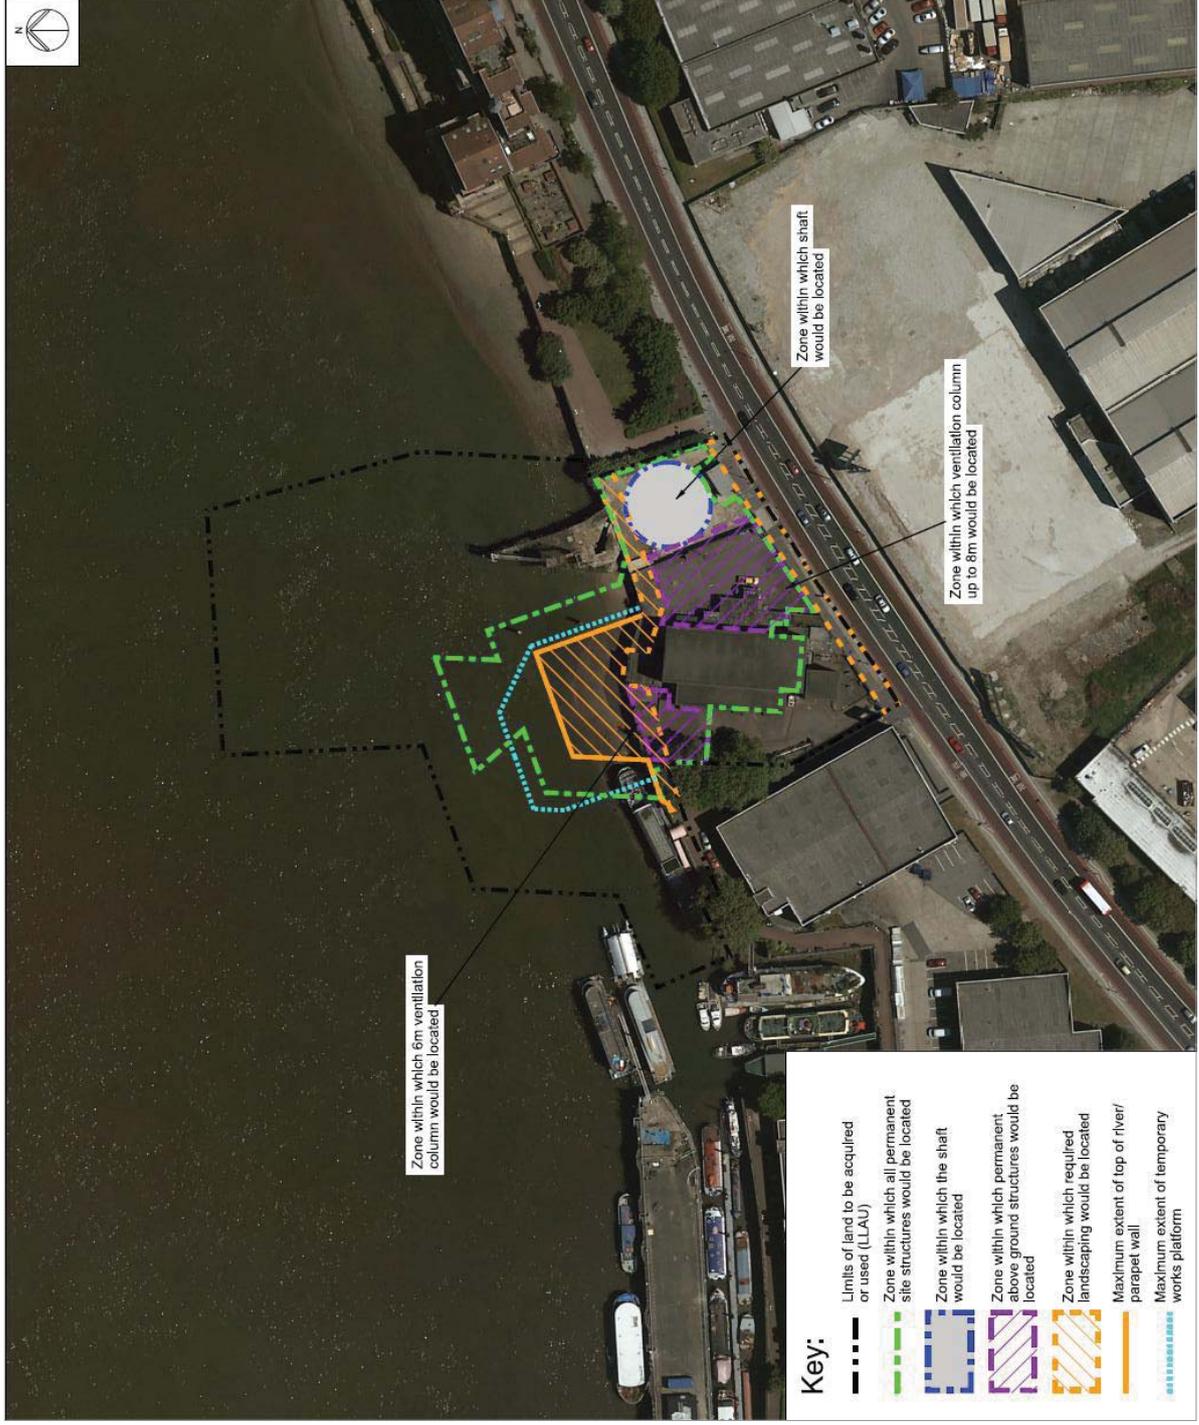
Schematic layout at the Heathwall Pumping Station site
